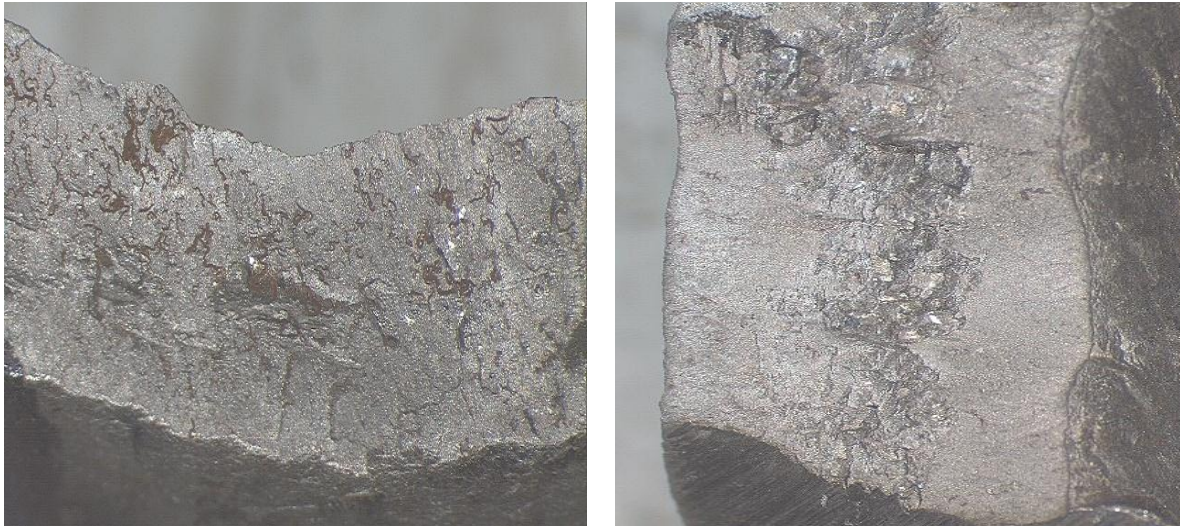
Stereo-photographs of torn cap of 6mm thick single plates, showing shiny appearance, an indication of brittle fracture
